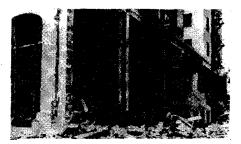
Taller ground story columns contributed to the damage of this soft-story building, Carrillo Hotel, 1925 Santa Barbara California earthquake.
